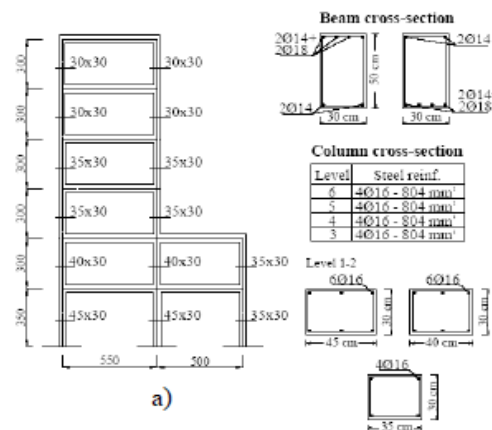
Irregular concrete moment resistant frame: structural scheme and element cross sections
